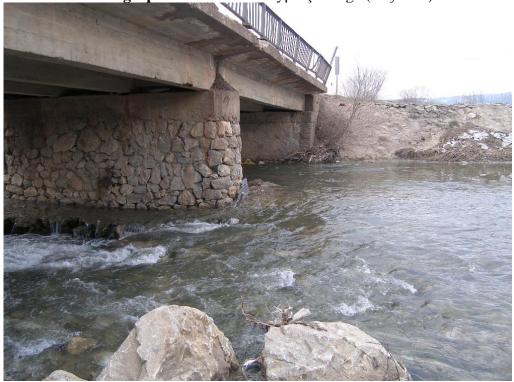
Station 8 Bolpat Bridge (Büyüksu)
